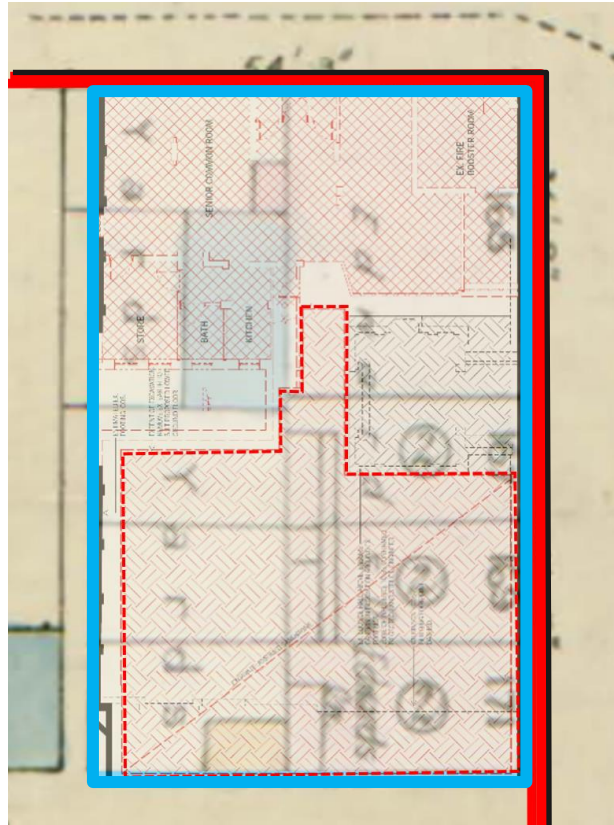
Overlay of demolition plan on 1888 Rygate & West plan indicating location of terraces and yards relative to proposed excavation footprint (indicated with red dotted line).
